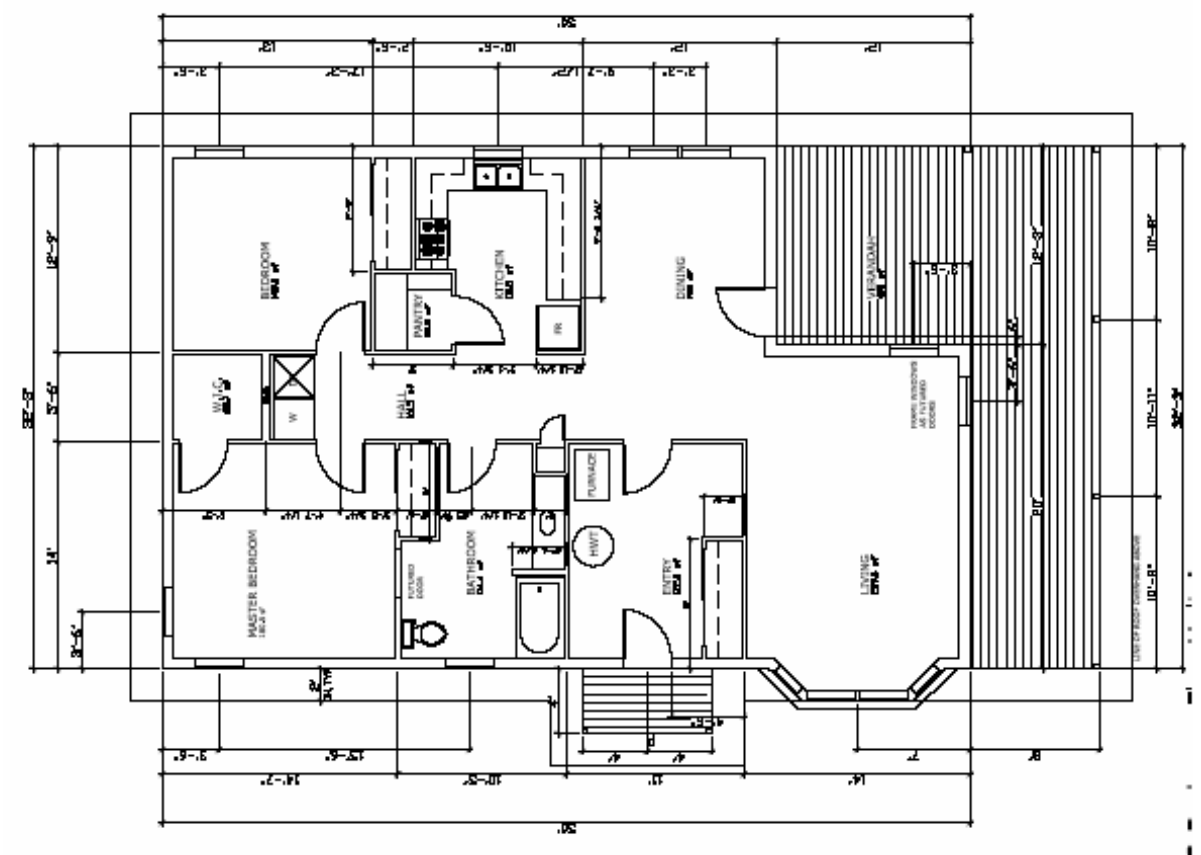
Existing Floor Plans of the Tr'ondek Hwech'in First Nation (Semple, 2007)
